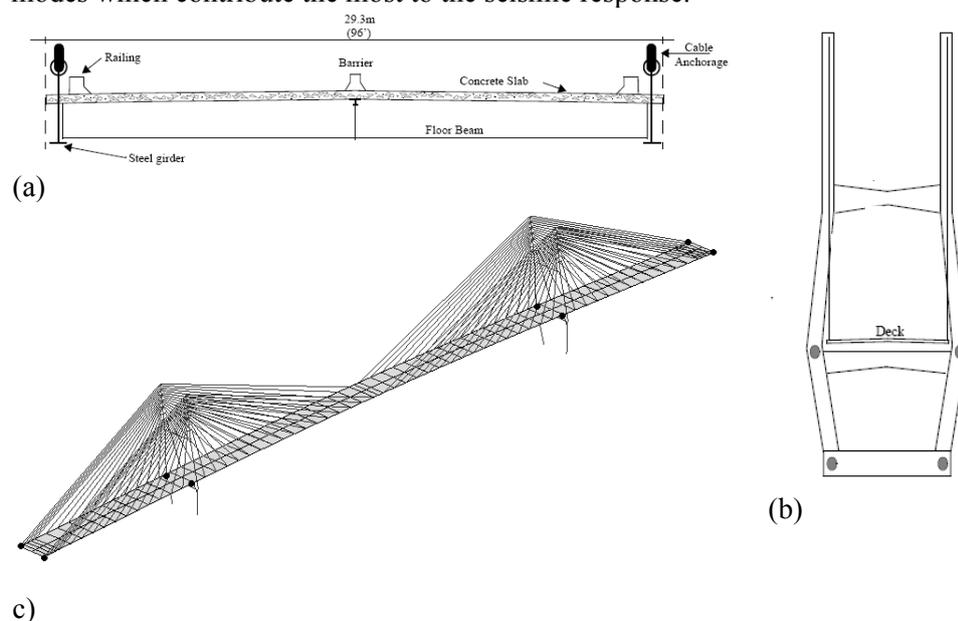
a) Deck cross-section. b) Towers' elevation c) FEM model.
